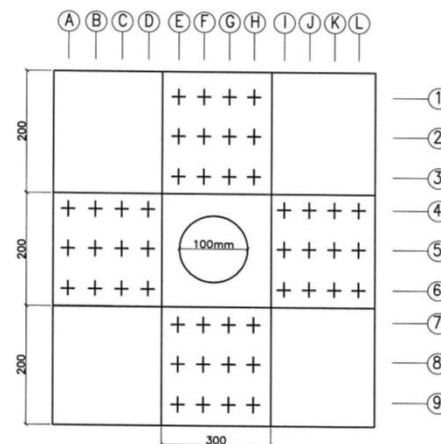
CORING AND REBOUND HAMMER TEST PLAN AT SOFFIT SLAB
